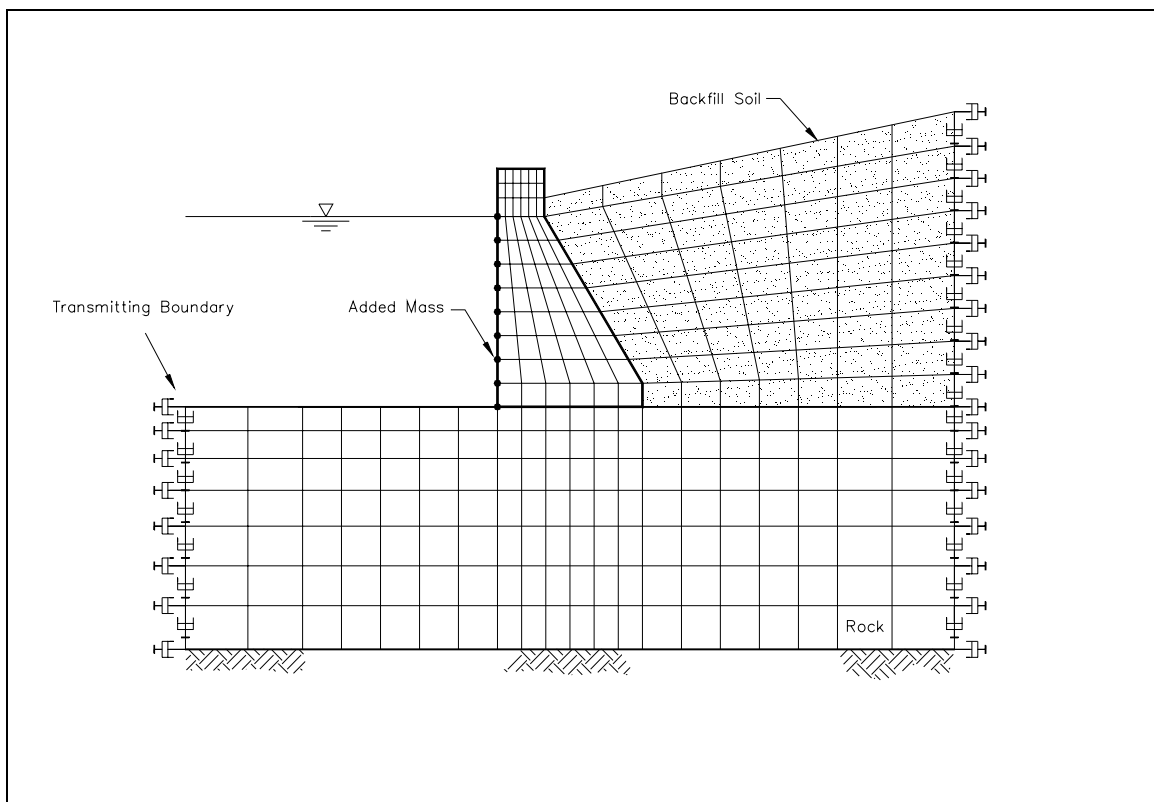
Finite element discretization of concrete lock wall, foundation rock, and backfill soil with transmitting boundaries
